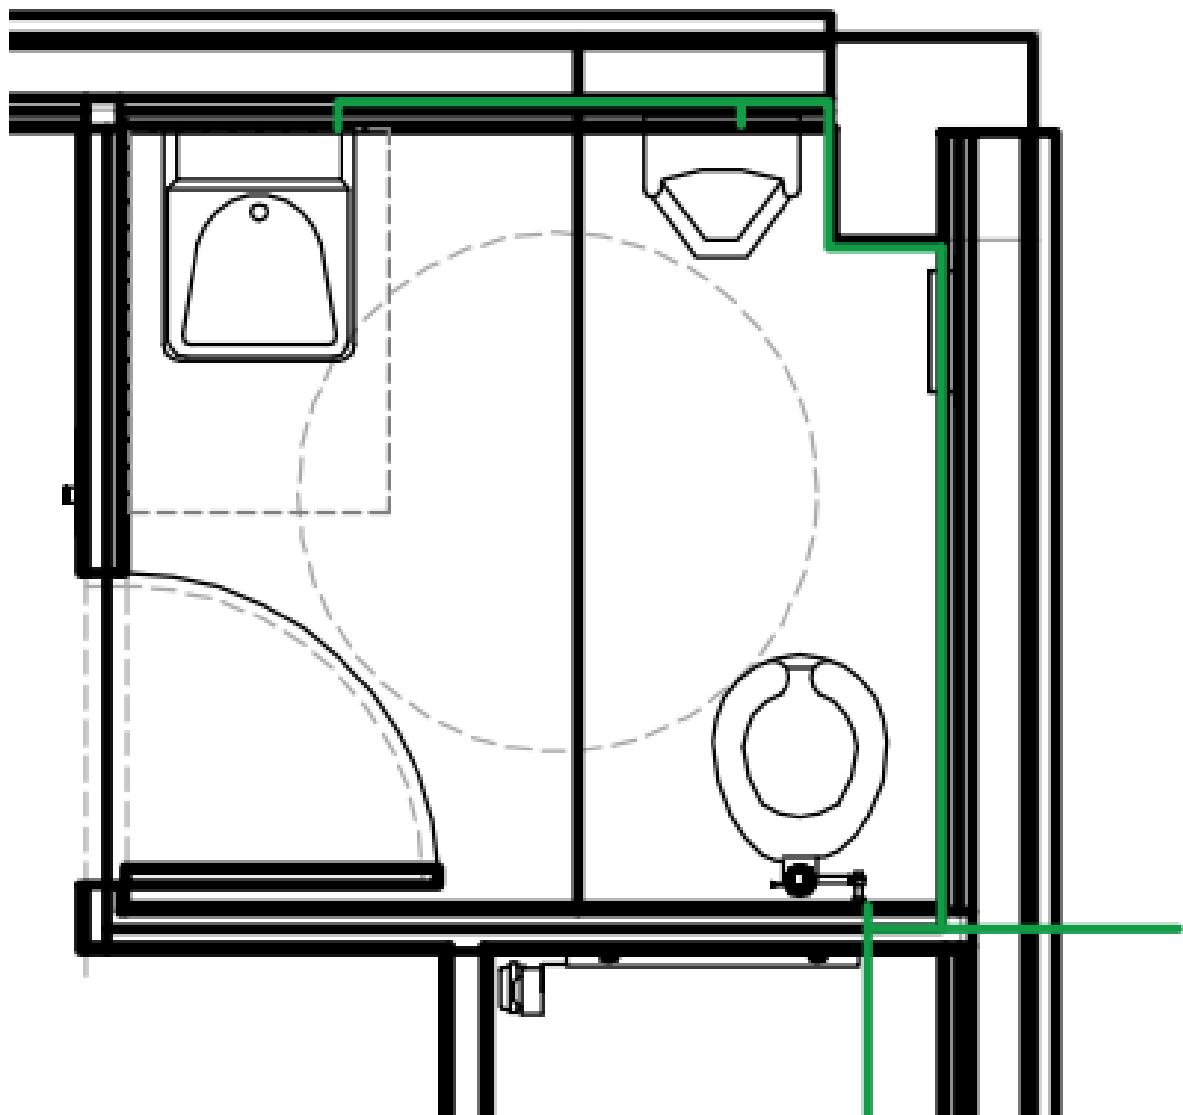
2D Sewer Pipe System Floor 1 (Enhanced View)
